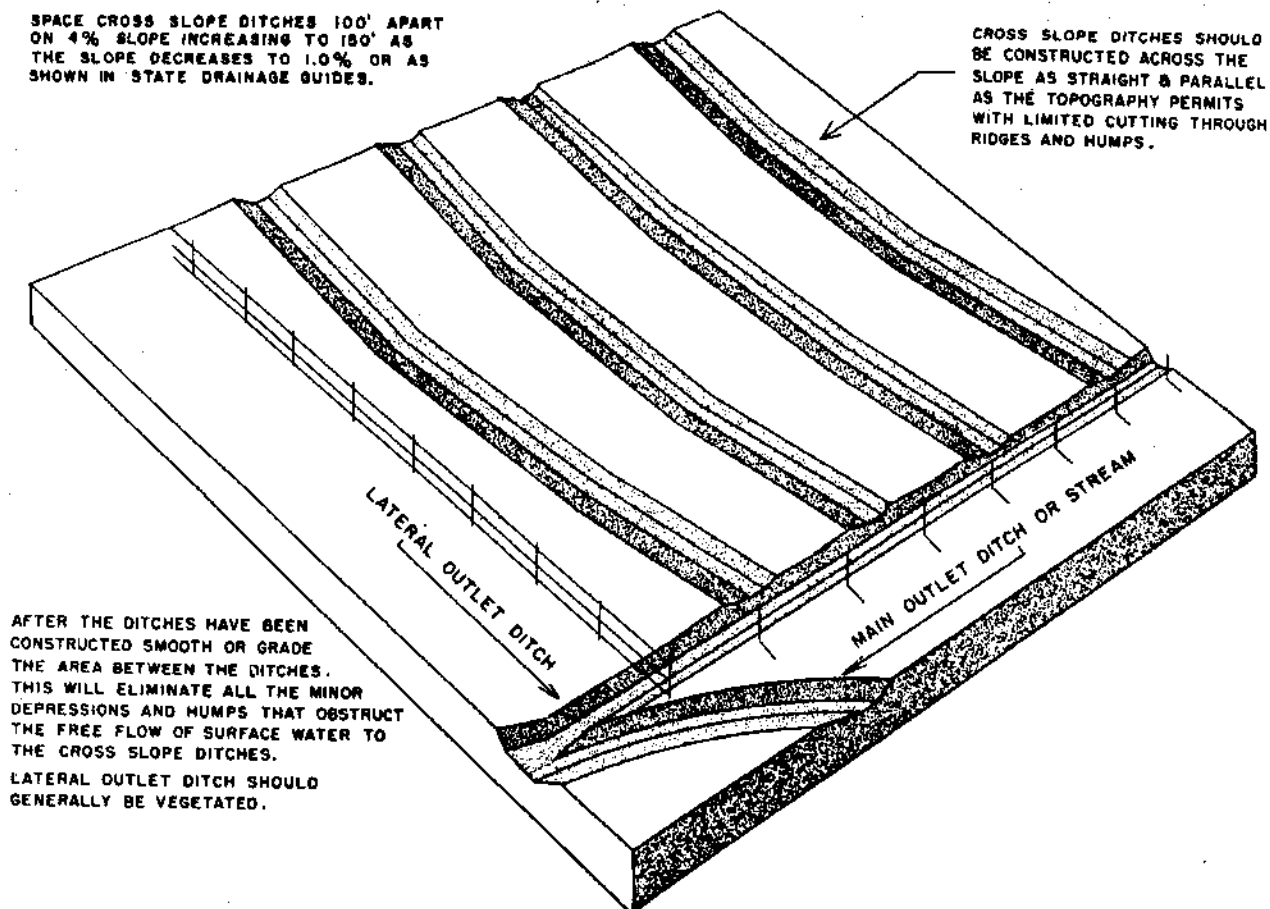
Cross slope ditch system of surface drainage-terrace type drain
